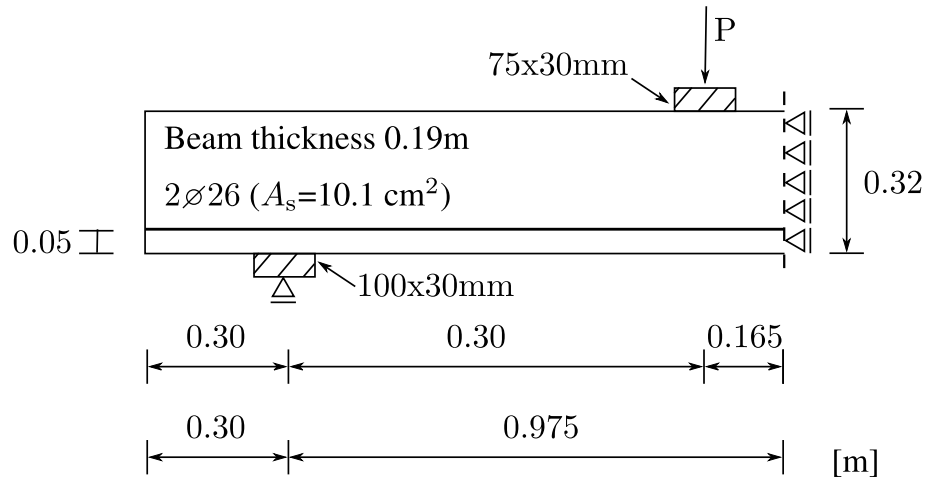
Geometry and setup of the reinforced concrete beam ([Leonhardt and Walther, 1962](#)).
